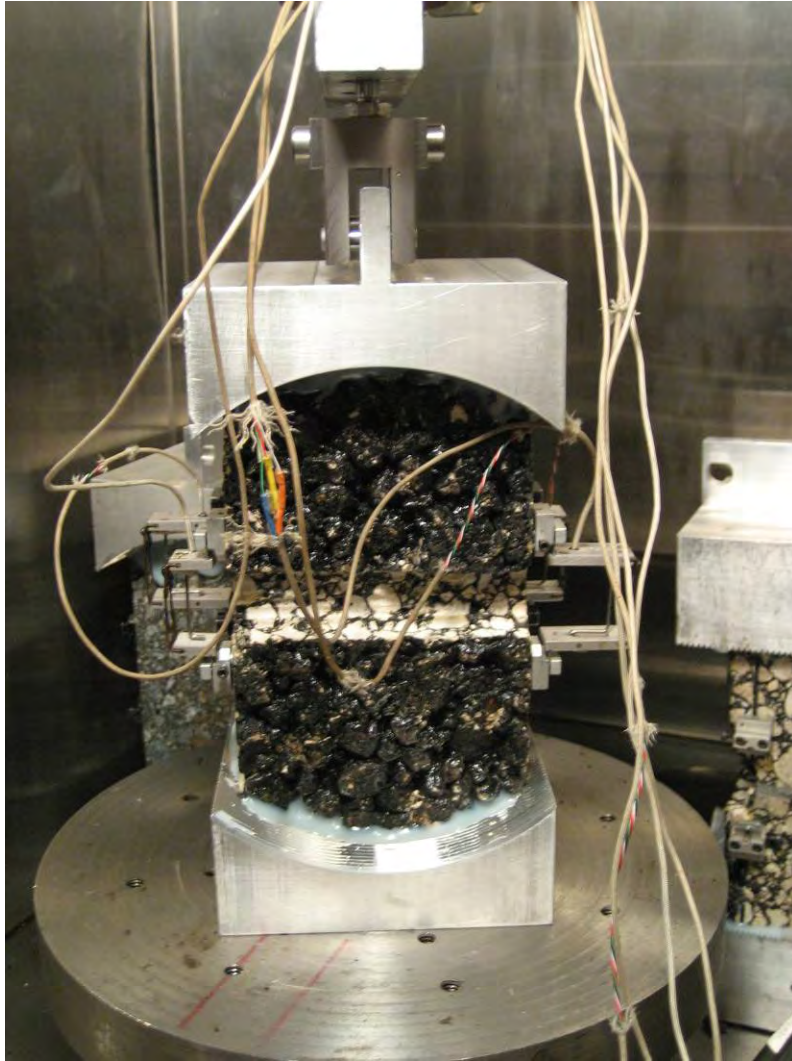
Test Prototype for Specimen with Diamond Saw Cut Groove
